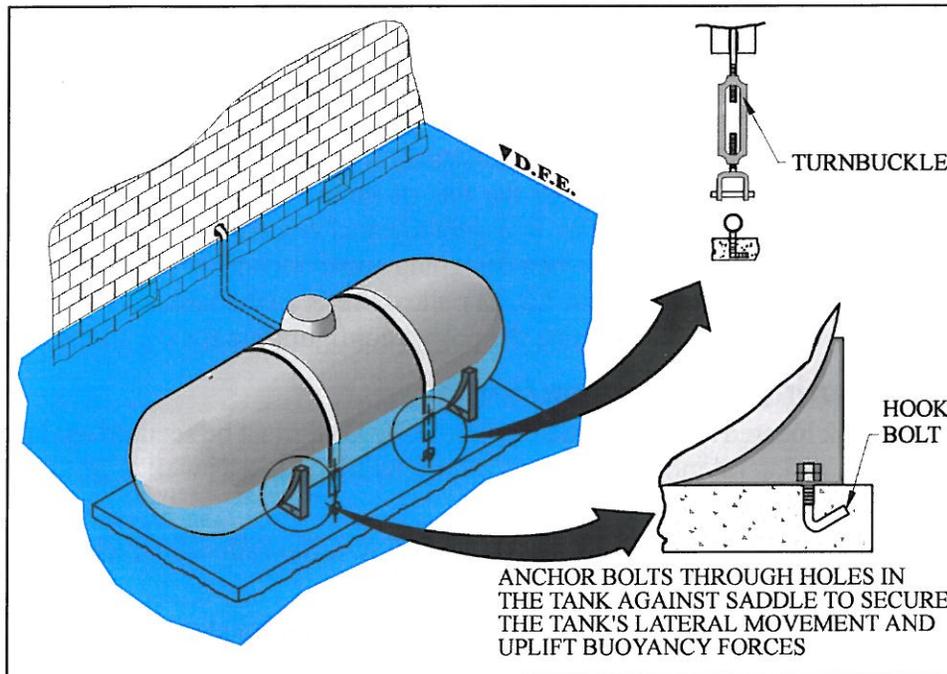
E: A typical tie down strap configuration of a horizontal propane tank
